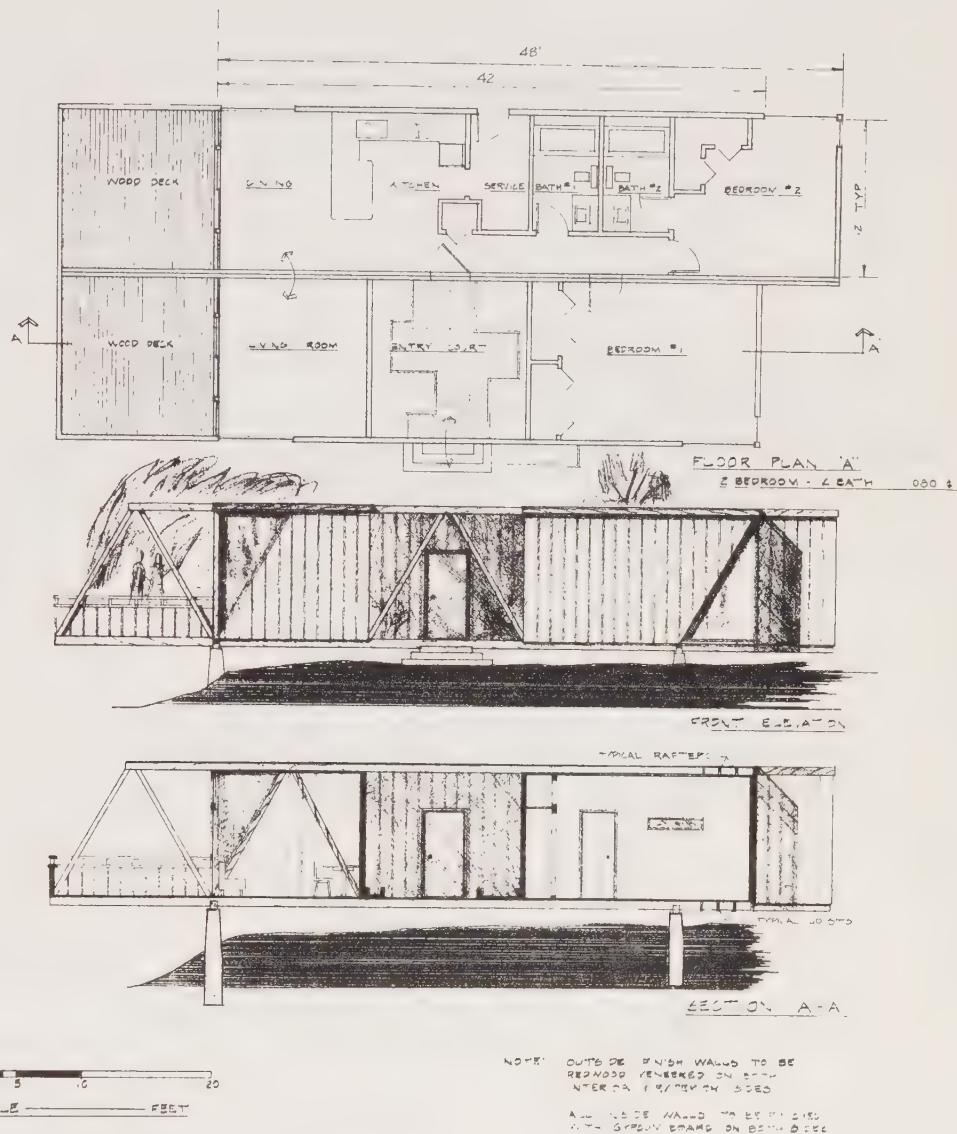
TRUSS-WALL FLOOR PLAN "A"
